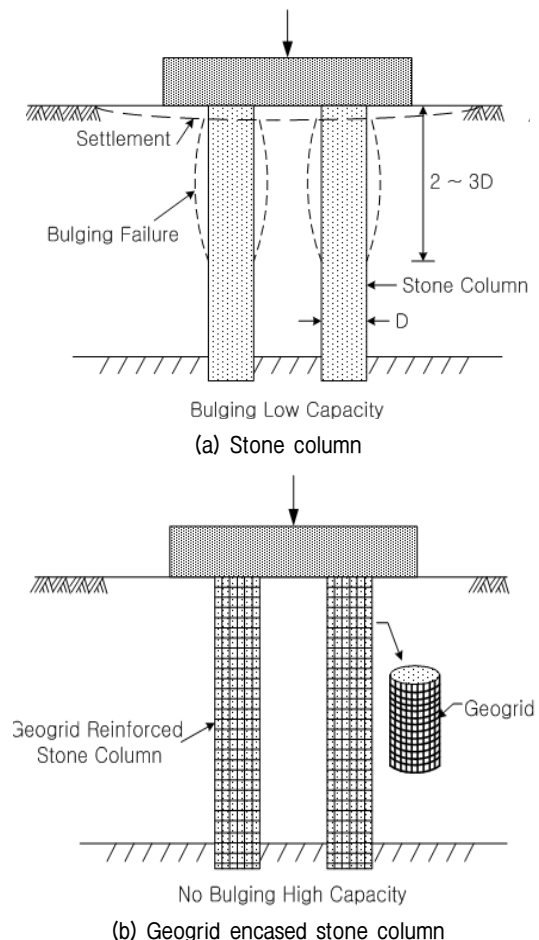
Failure modes of stone column groups (Barksdale and Bachus, 1983)
